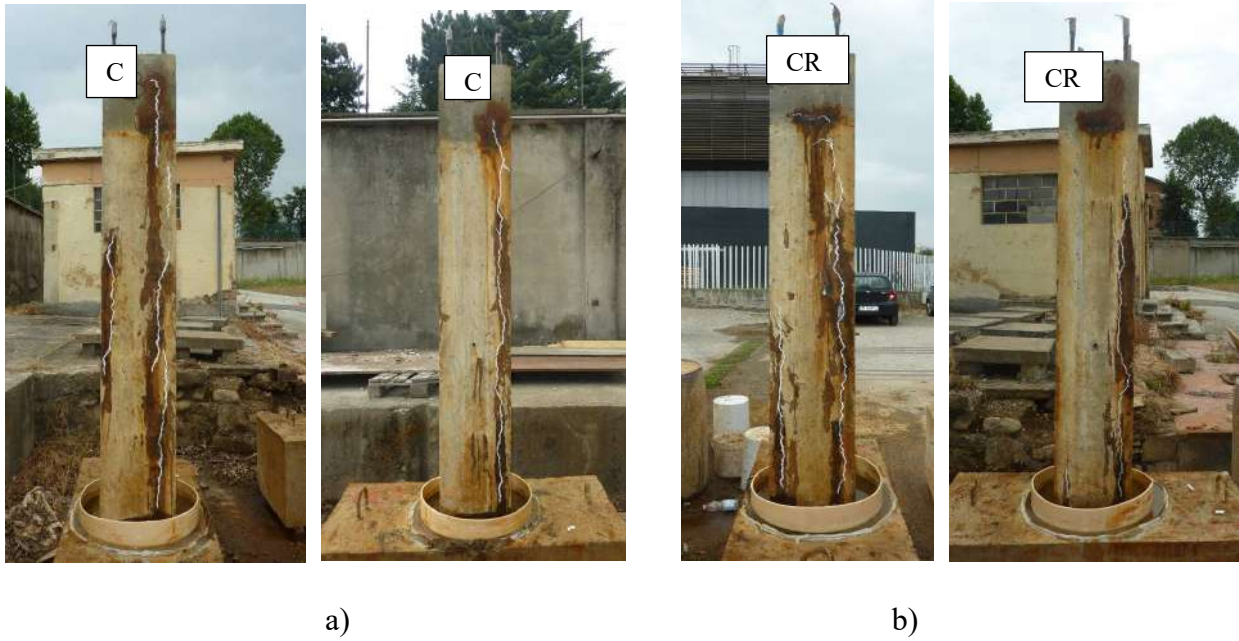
Specimen after corrosion process – crack pattern; a) specimen C; b) specimens CR
